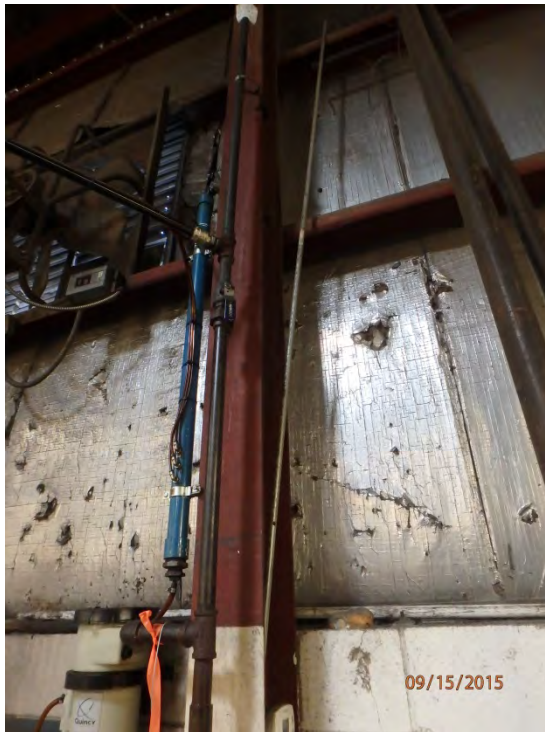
View of piping on west wall formerly connected to the air compressor.
